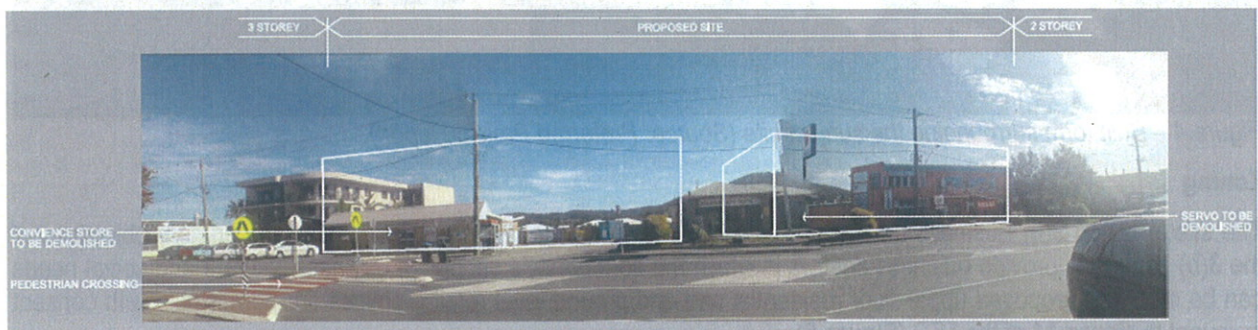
View looking west of subject site from Tweed Coast Road (Source: Environmental Assessment).
